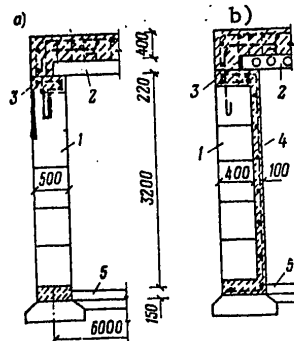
Outside walls of shelters made of prefabricated concrete modules.
